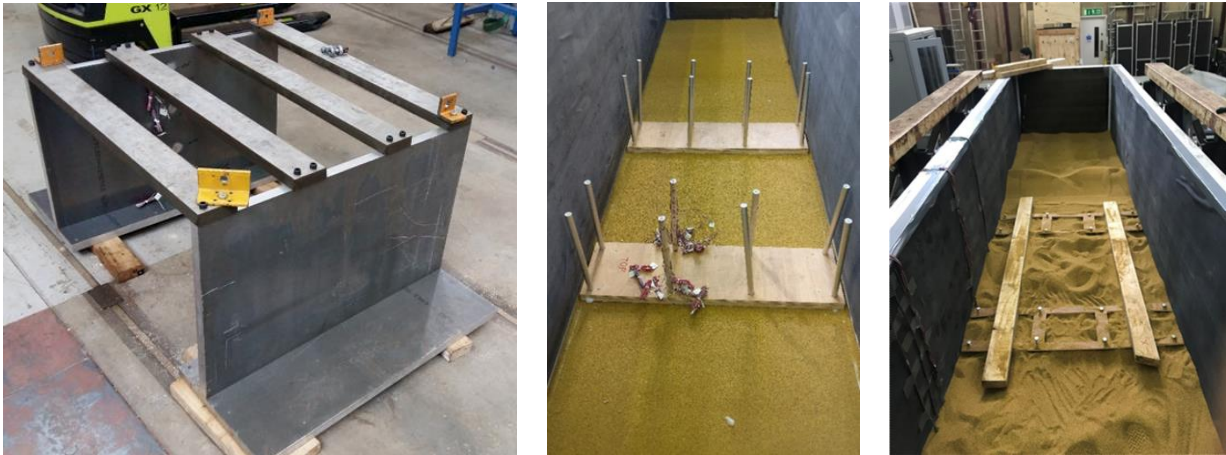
(a) bridge model used in experimental campaign; (b) Position of foundation piles in the Equivalent shear beam container before filling with sand; (c) Soil container with foundation piles after
